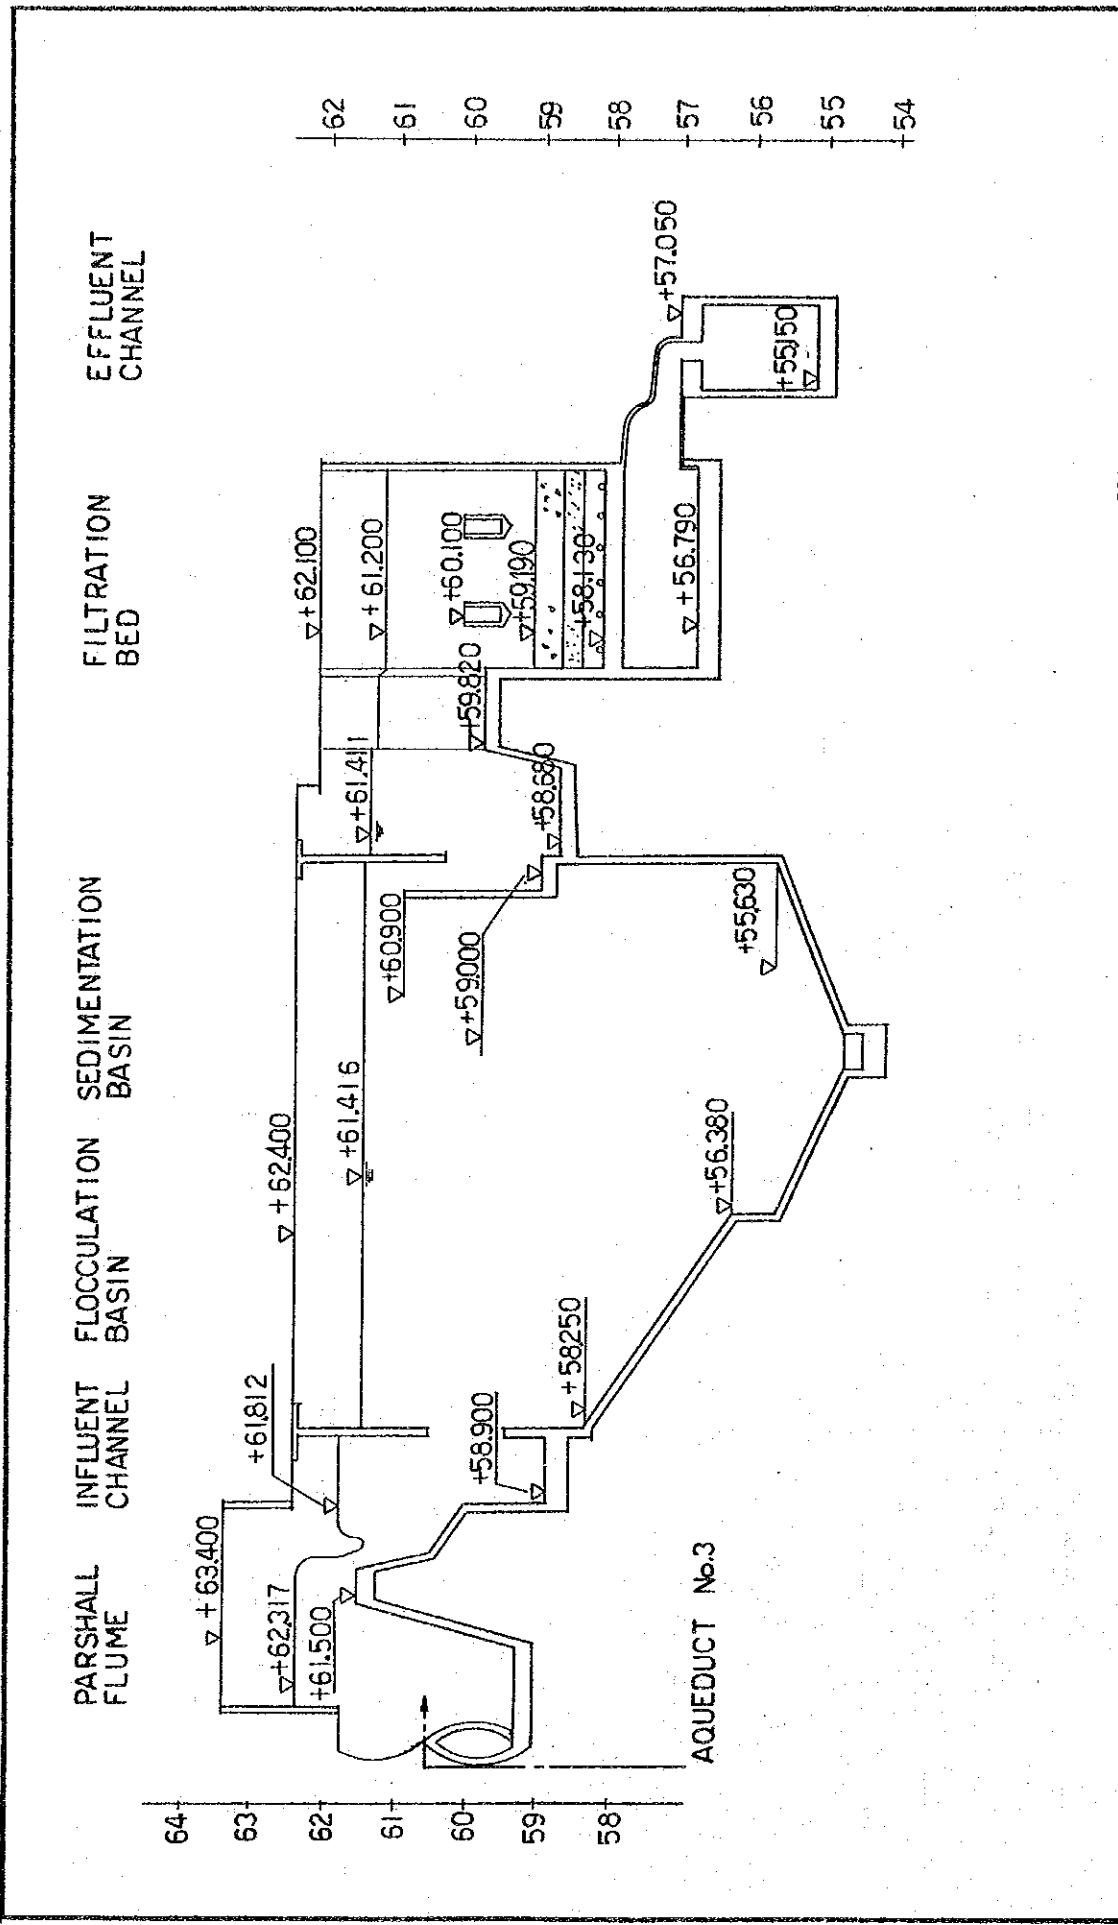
ACTUAL HYDRAULIC PROFILE OF PLANT NO.2
